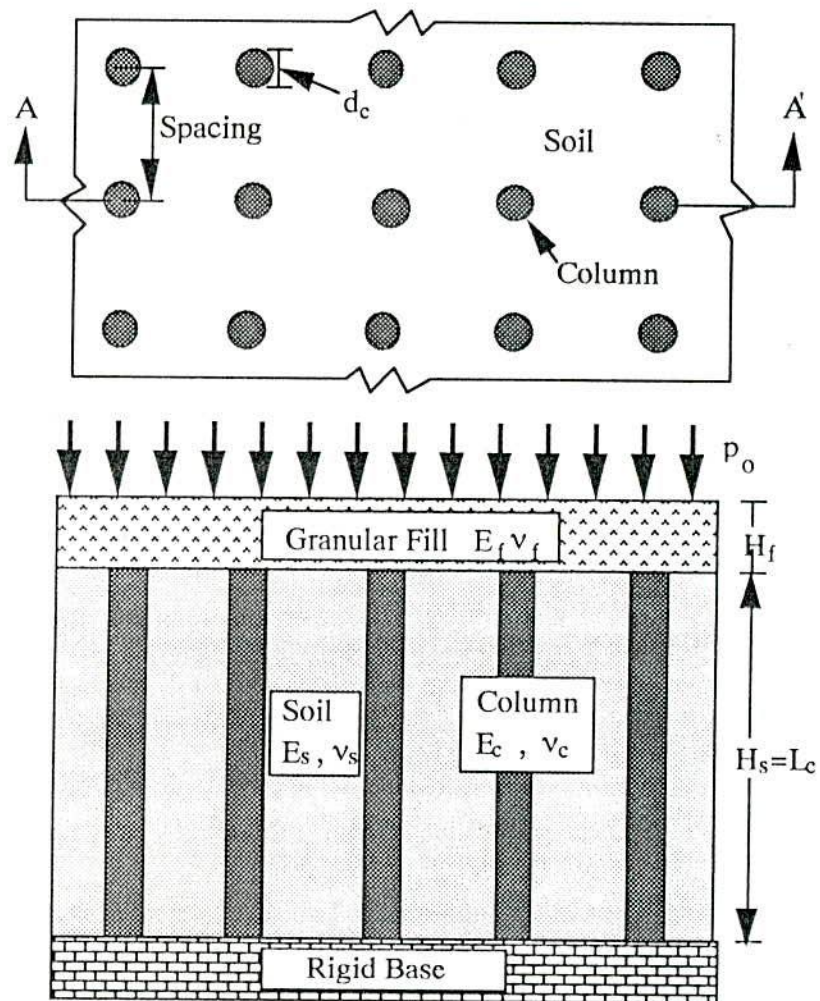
(a) The system to be analyzed: Plan and section of nonstratified soft soil system reinforced by end bearing columnar inclusions.
